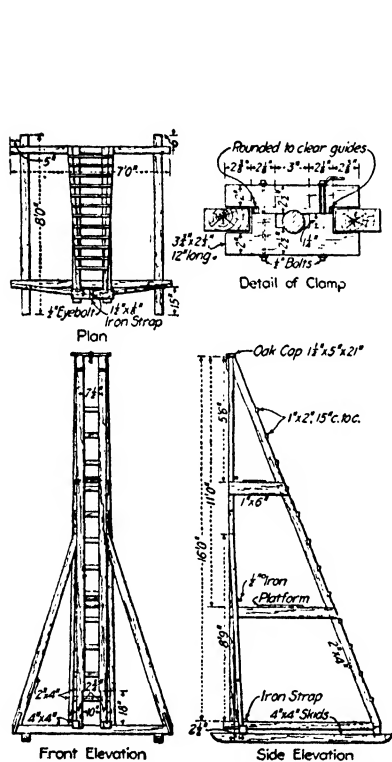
Light Leads of Drill Outfit Built to Drive and Pull Sounding Rods.
